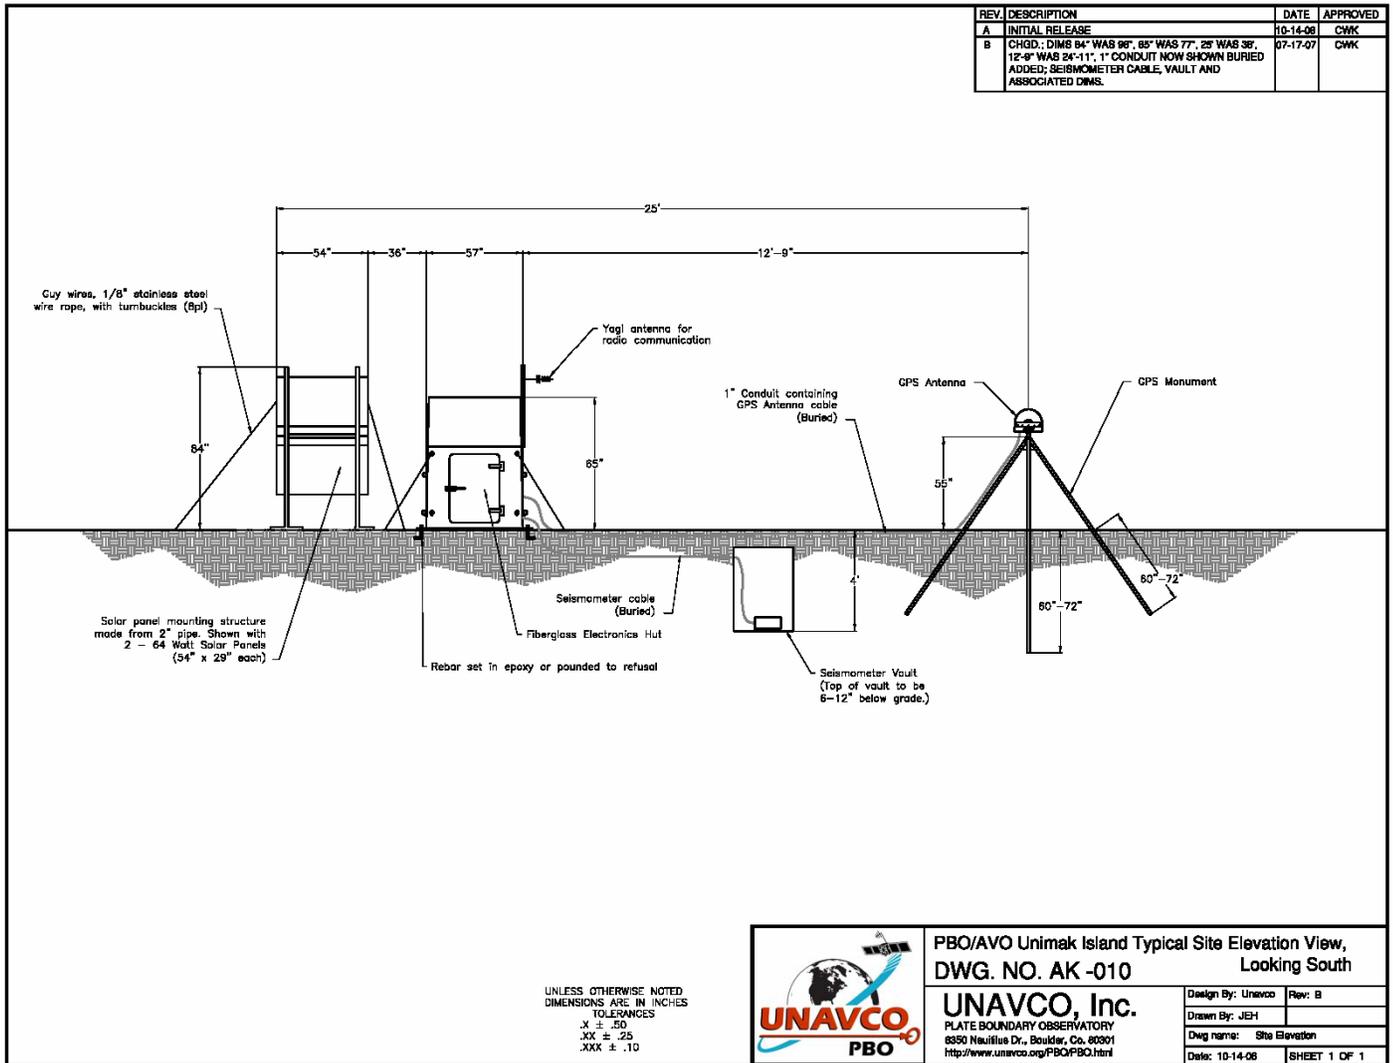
Typical drawing of a short drill-braced monument, equipment enclosure, solar panel support structure and seismometer
